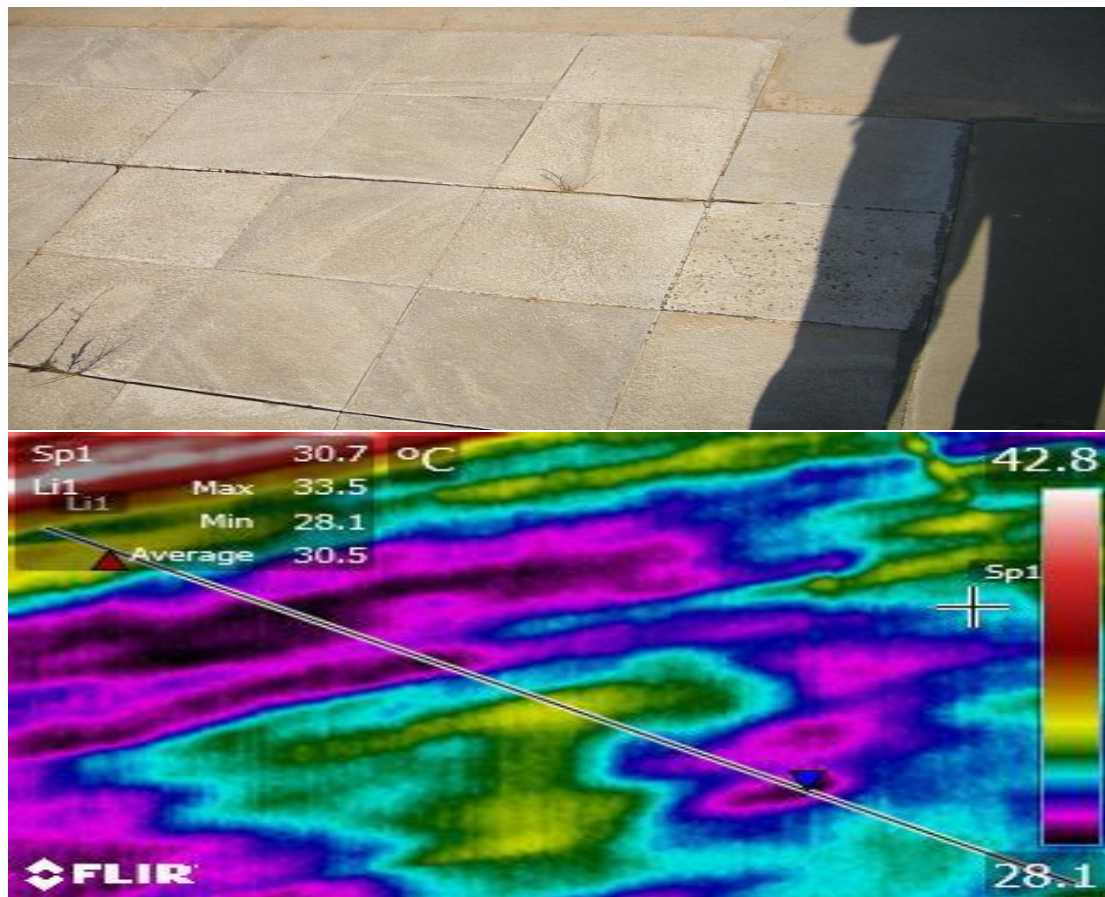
Thermal and visual photo of 3rd floor's roof tiles
